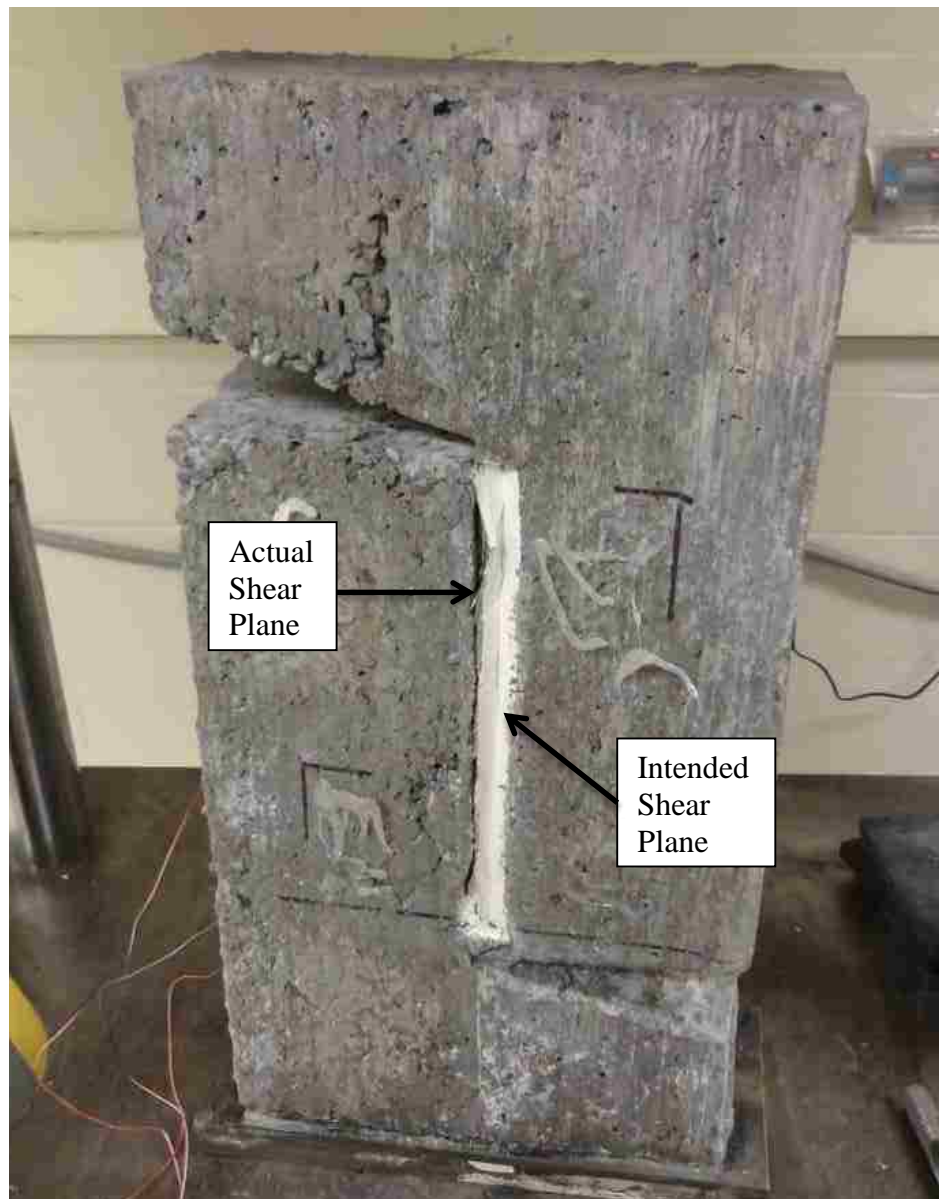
Shear plane crack of specimen S-SL-CJ-S-17-1
